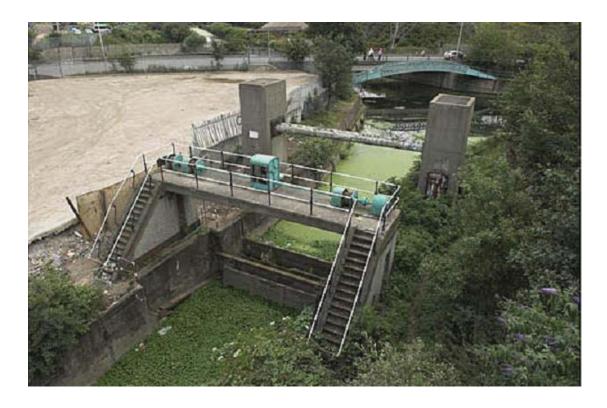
View of Carpenter's Lock with City Mill River Footbridge in the background, looking south-southeast: OL-03007
